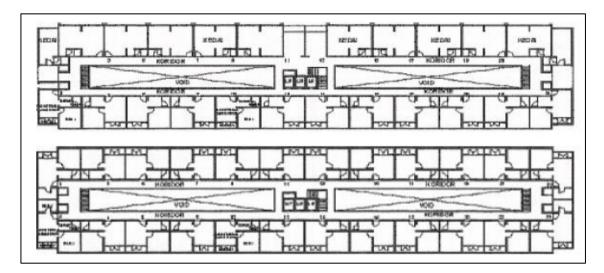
Floor Plan of Rifle Range Flats, Penang
